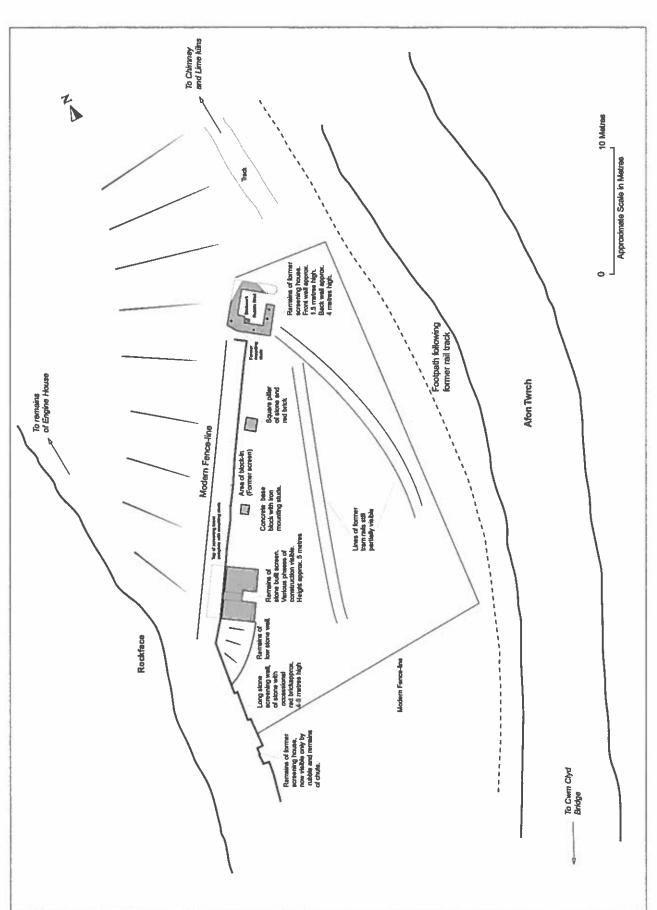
Site Plan showing remains of former Lower Bryn Henllys Colliery, Cwm-Twrch. (Not to scale)
